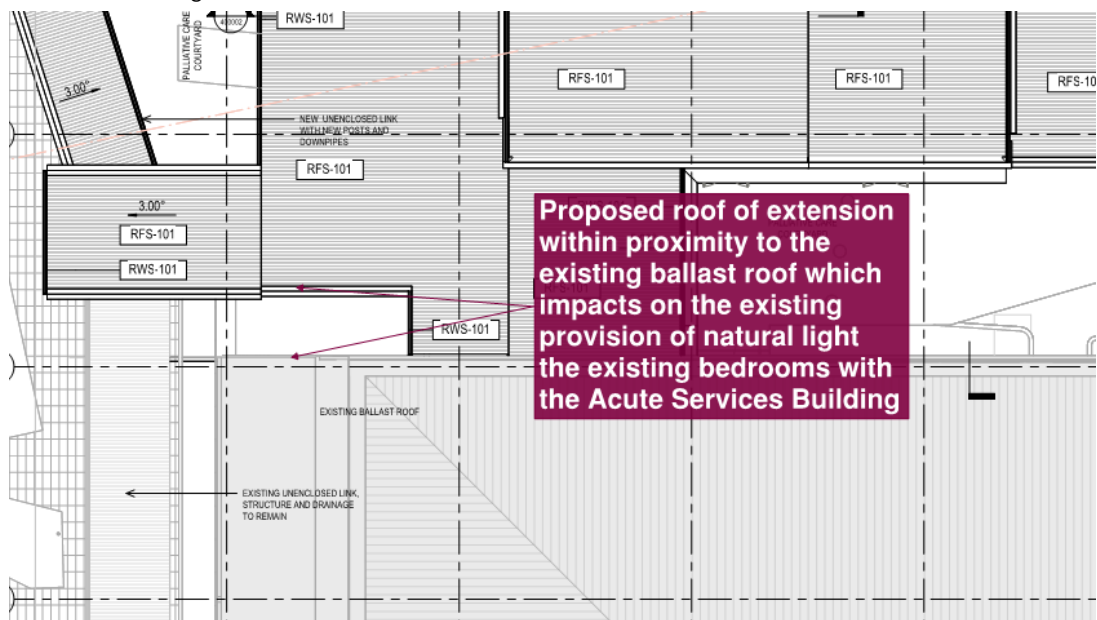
Proposed roof over the new entry to the Palliative Care extension within proximity to the existing ballast roof of the existing Acute Services Building
